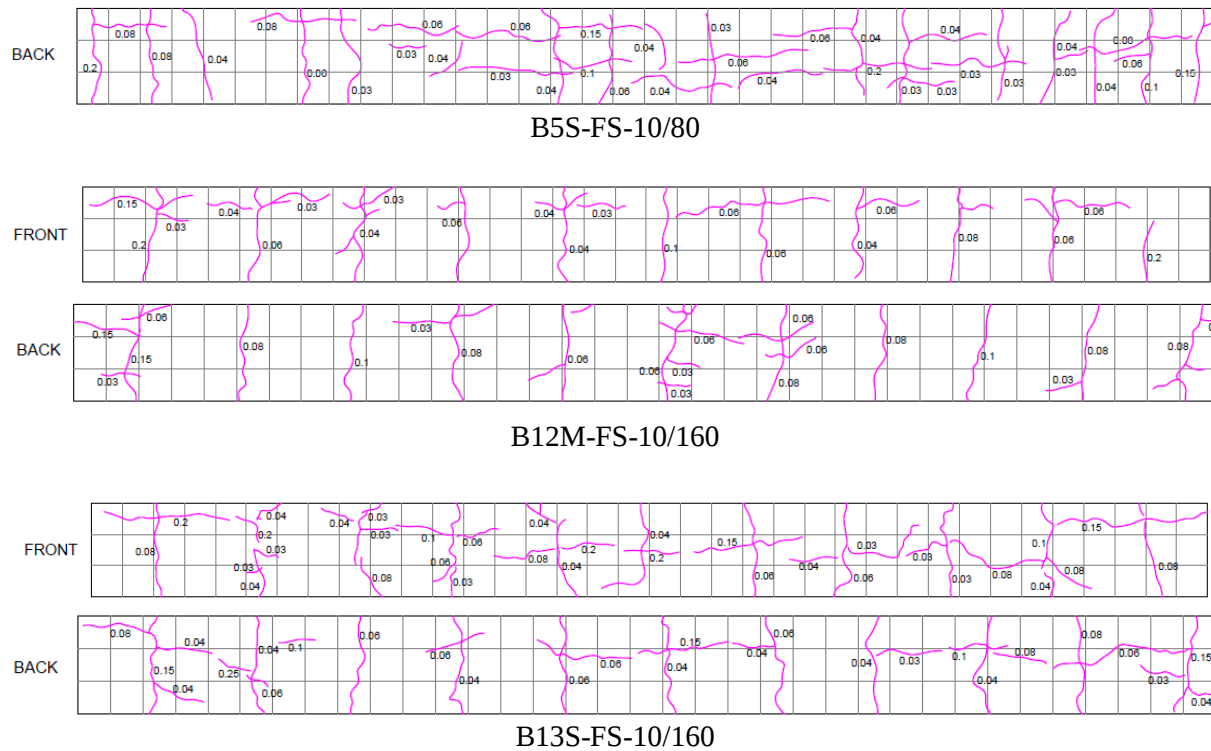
Corrosion cracks distribution of D10, 80 mm and 160 mm beams
